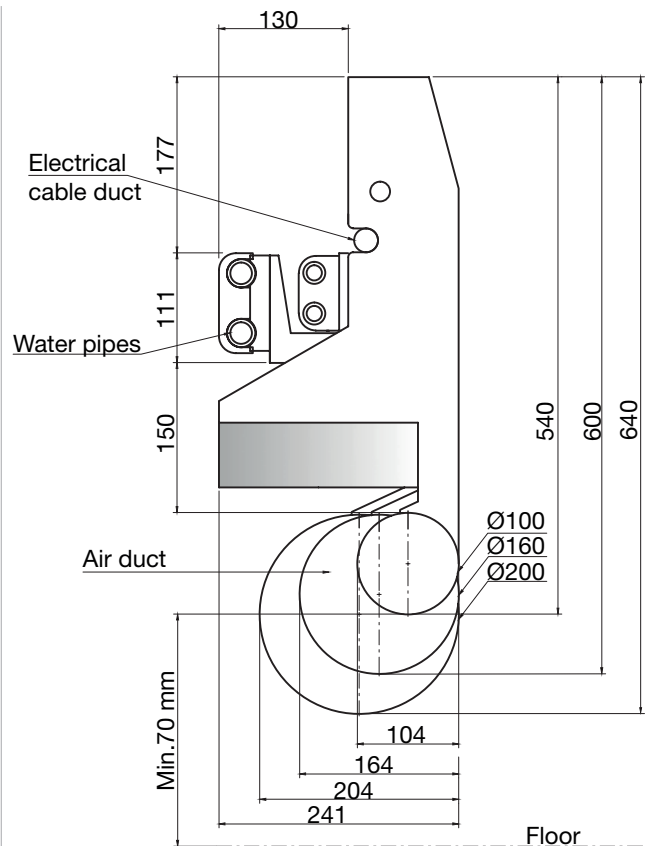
Measurements for Fasadium, with a view to adjusting the casing.
